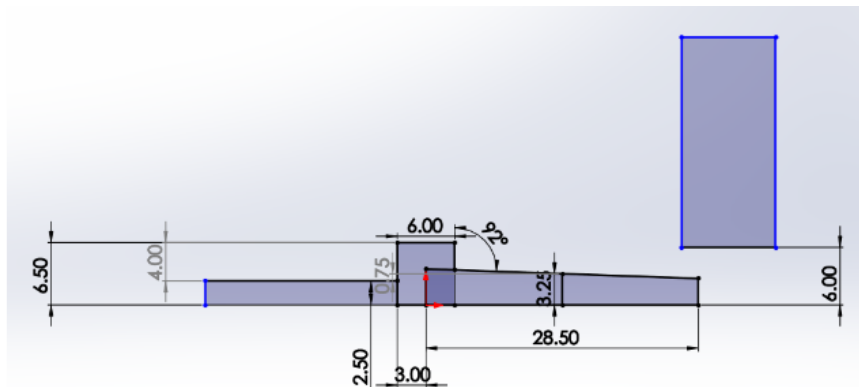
C: Side-view showing geometry for “Shower” mockup used for participant testing (all dimensions in inches).
